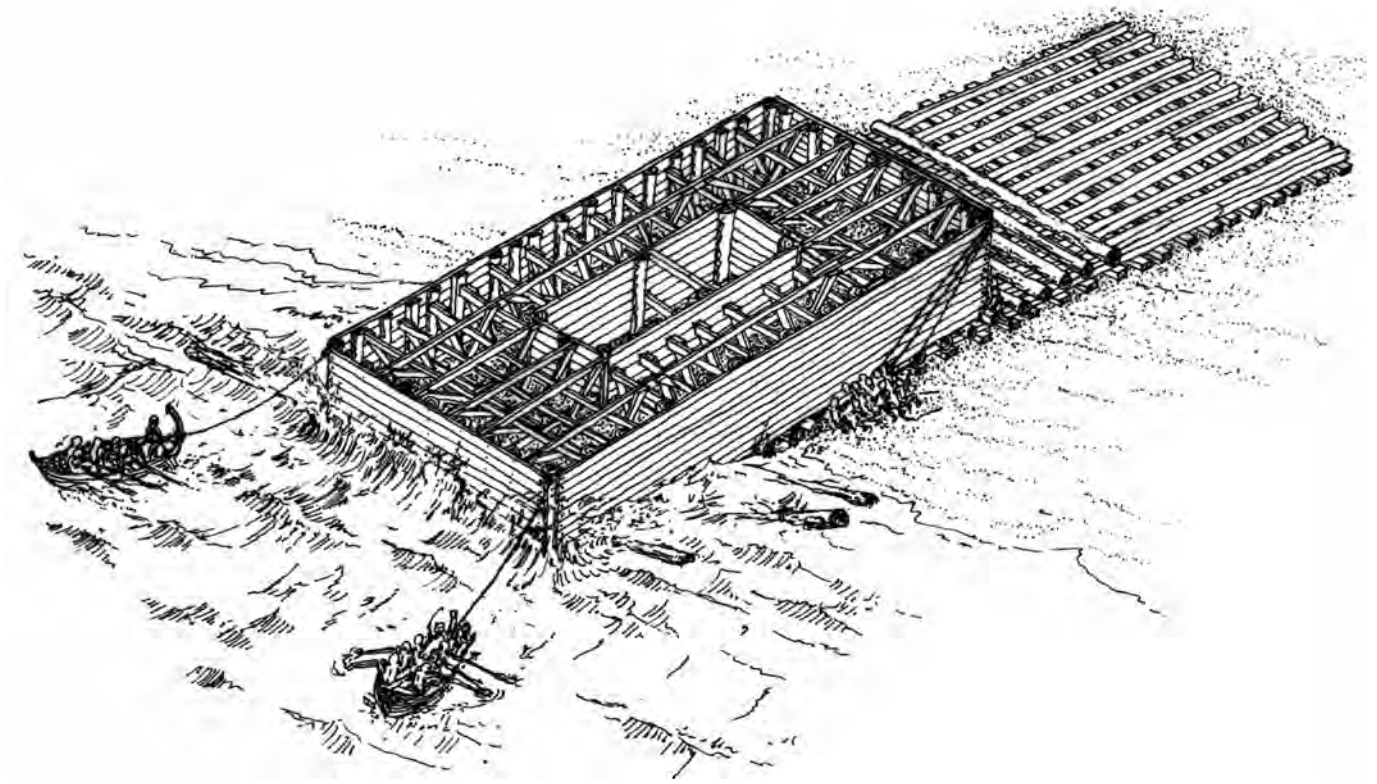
Reconstruction of a prefabricated floating caisson being launched into the sea near Sebastos (C. J. Brandon).
